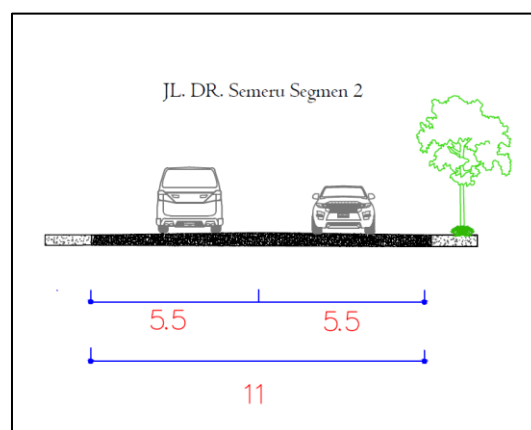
Coss Section Figure of Dr. Sumeru Road
